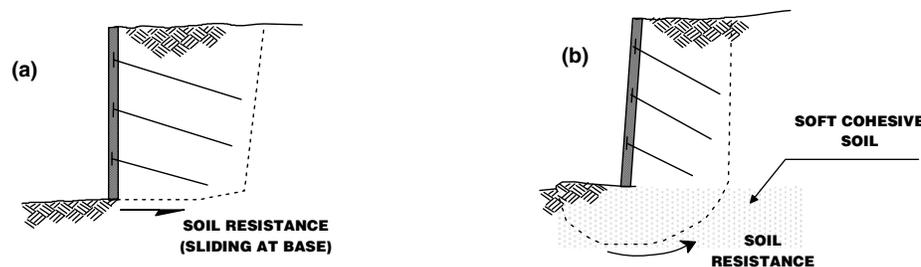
Soil Limit States: (a) Sliding Stability; (b) Basal Heave
